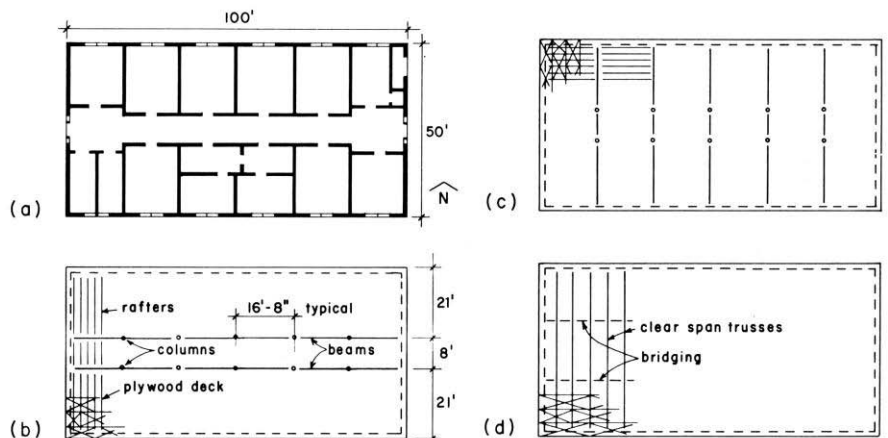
Developed plan for interior partitioning and alternatives for the roof framing.
